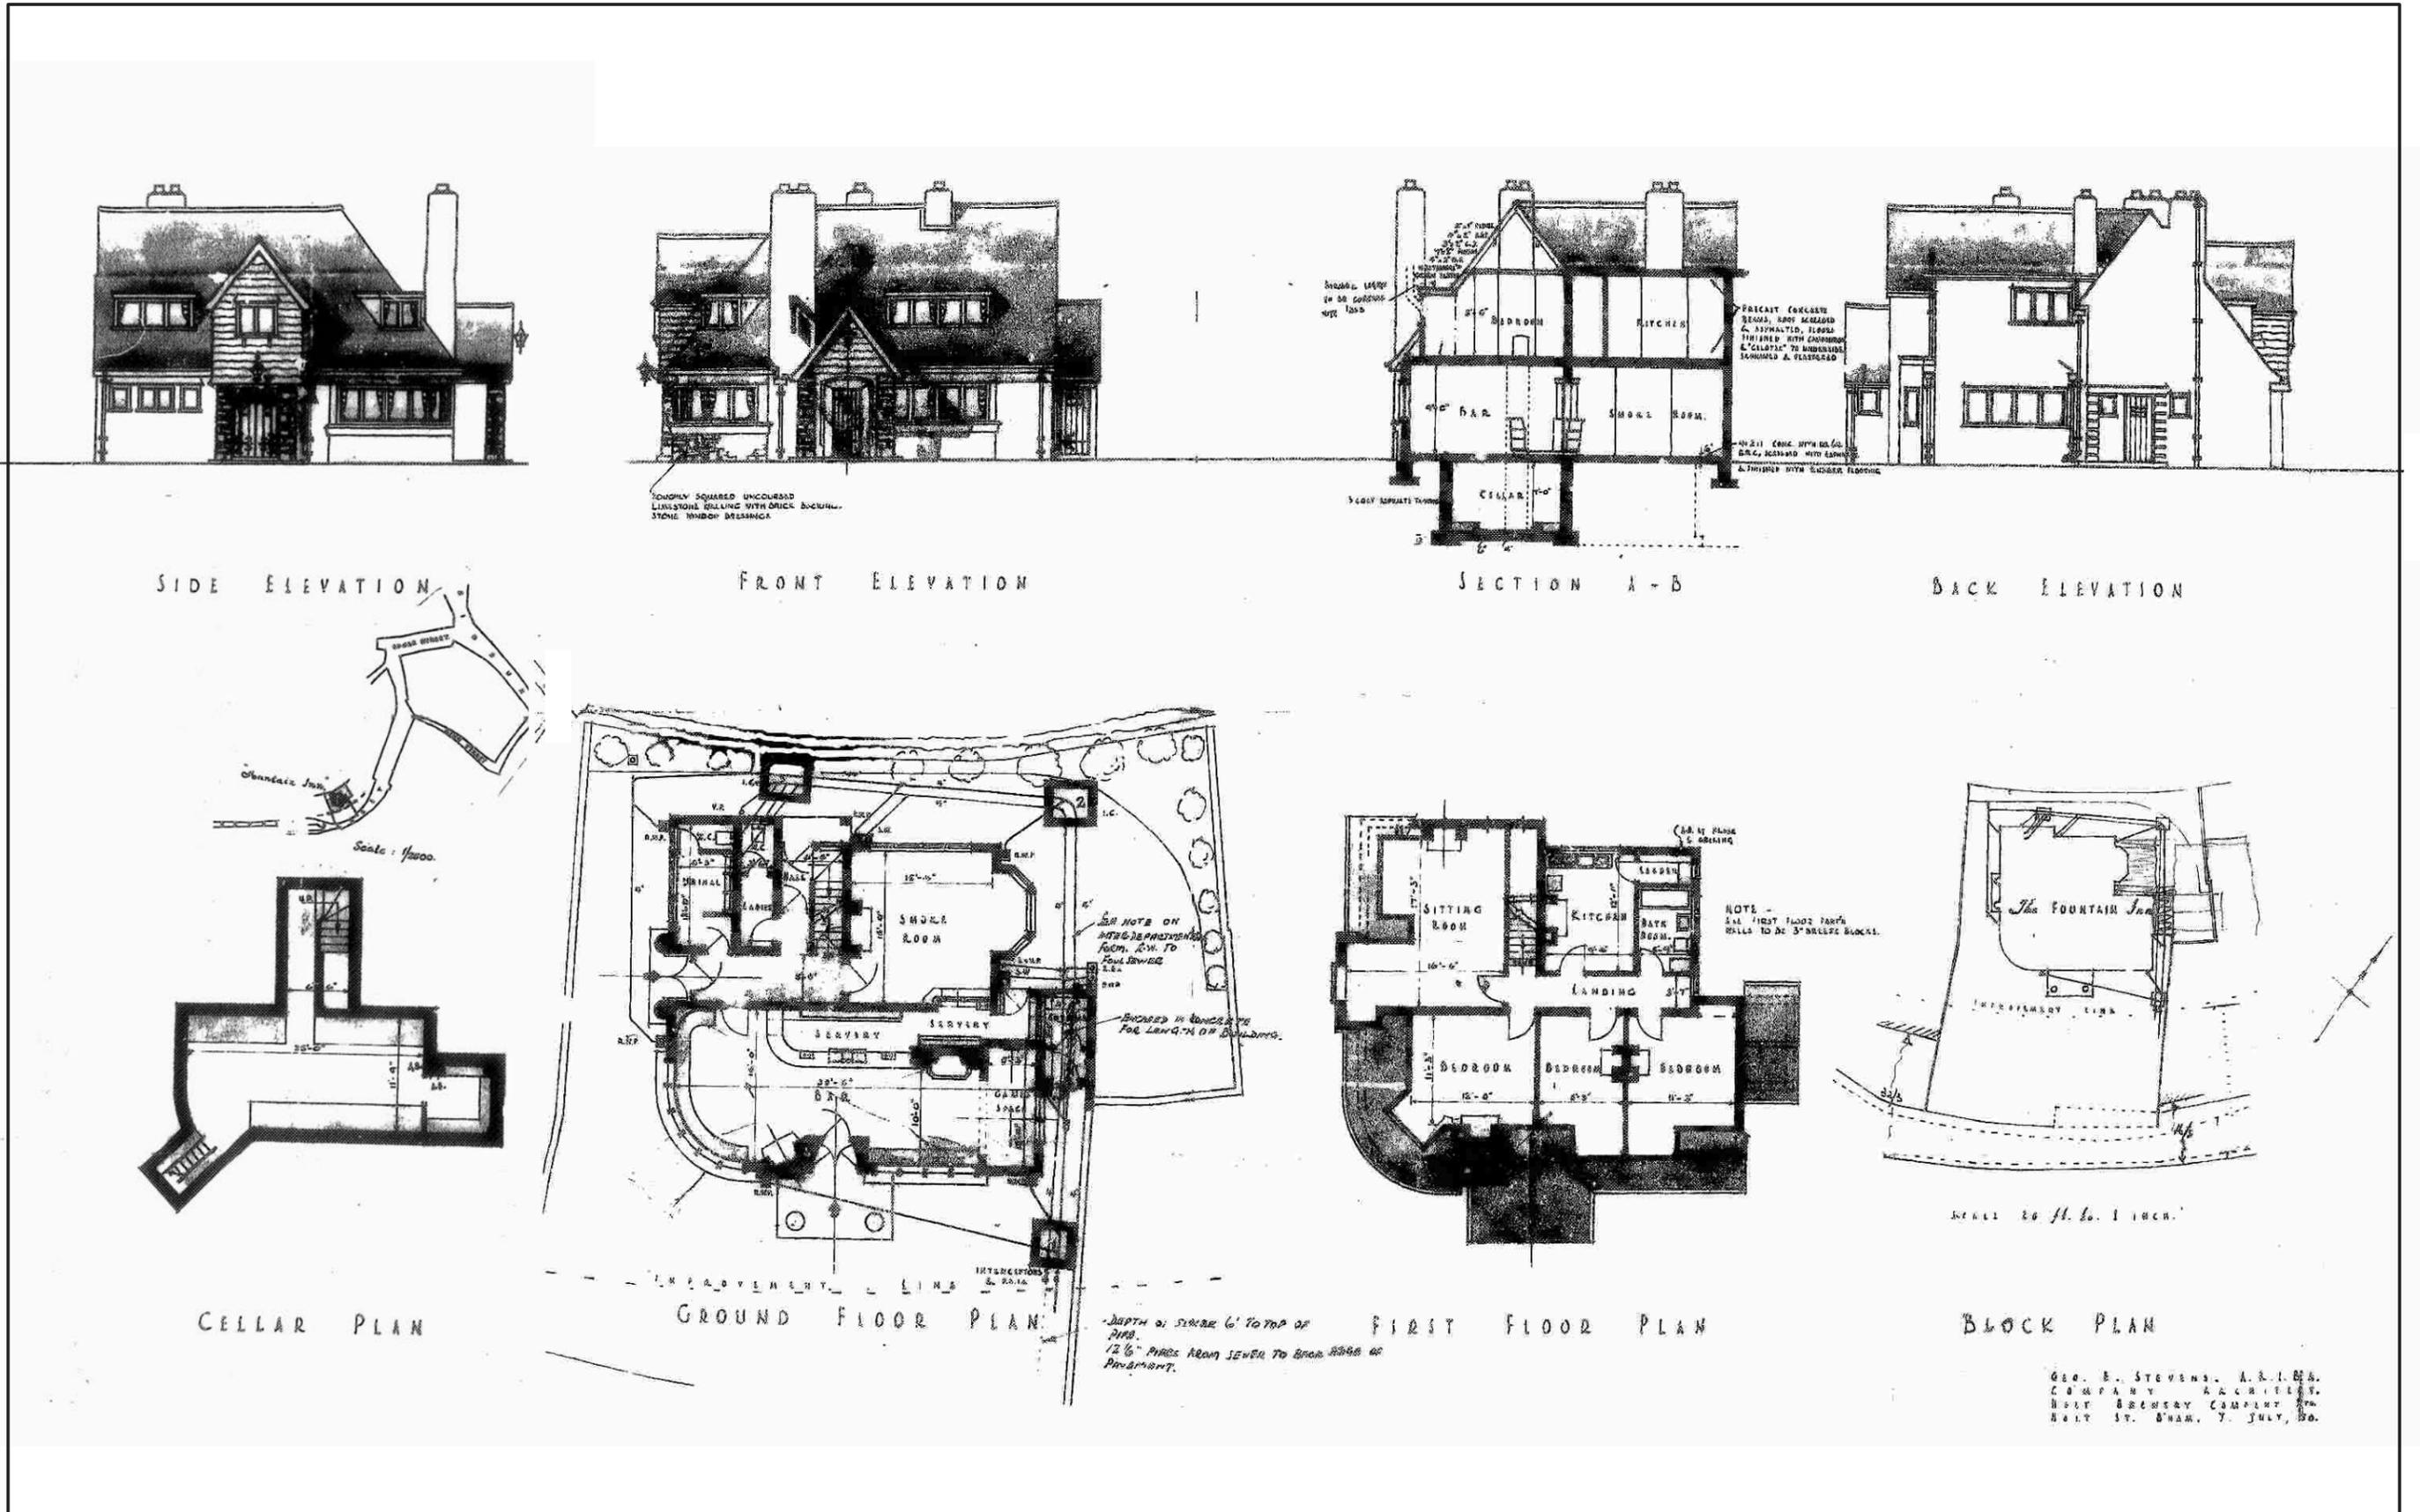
Original Planning Application drawings - note that the as-built scheme had a larger cellar, and retained the earlier stable block to the east
